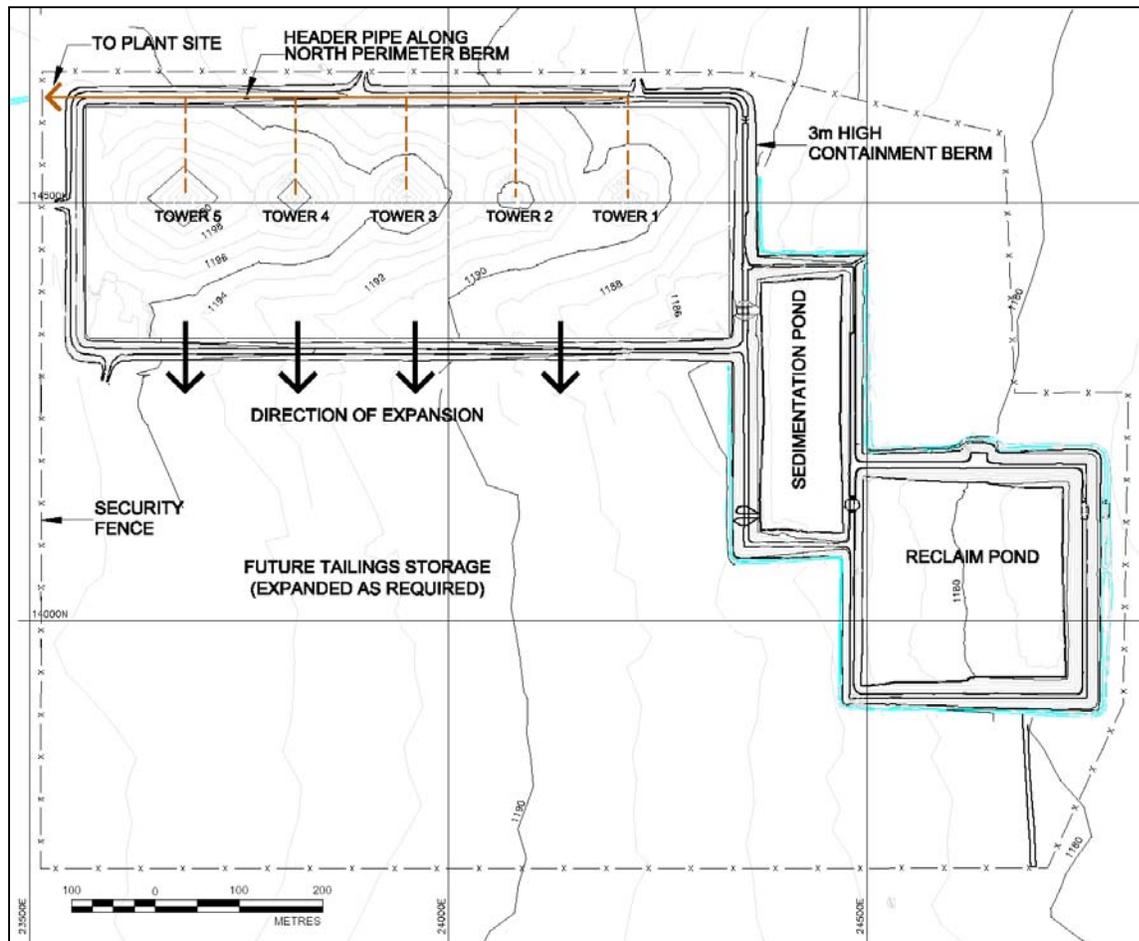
Plan view of “Cell 1” of the Tailings Storage Area showing the direction of future expansion.
